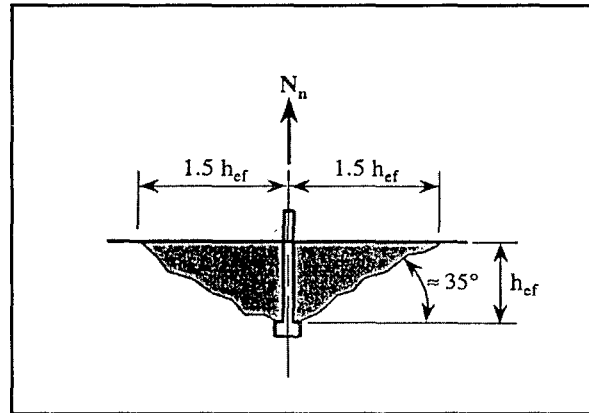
Breakout cone for tension.
